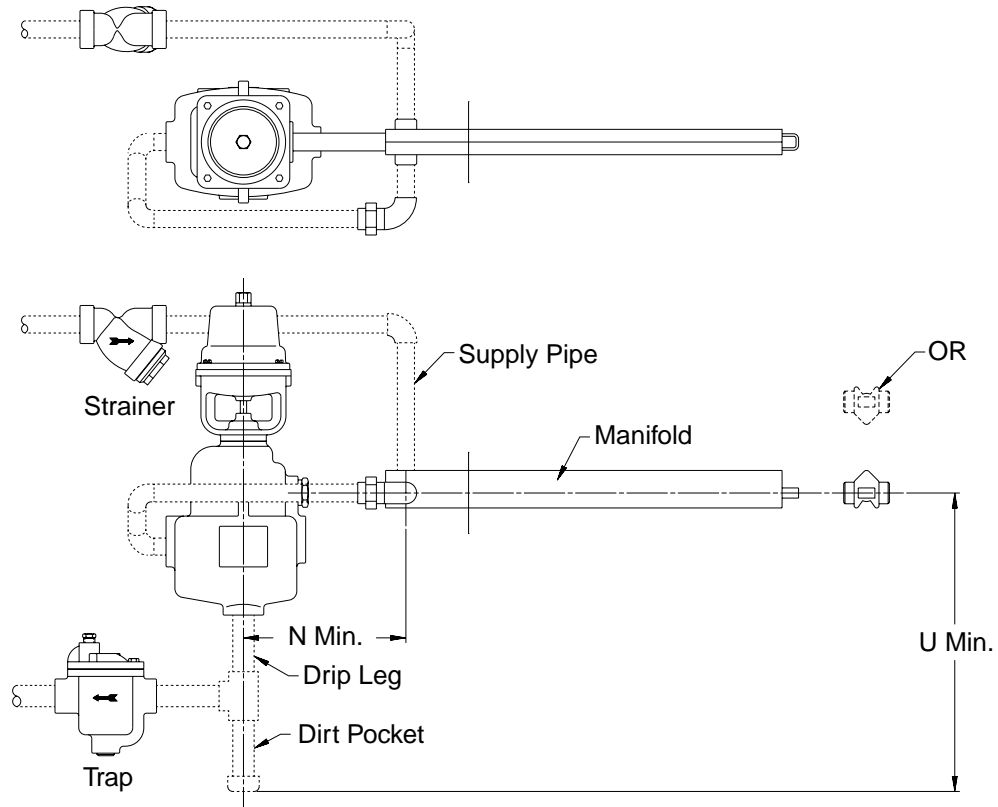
Installation Method Where Vertical Manifold Installation is Required
